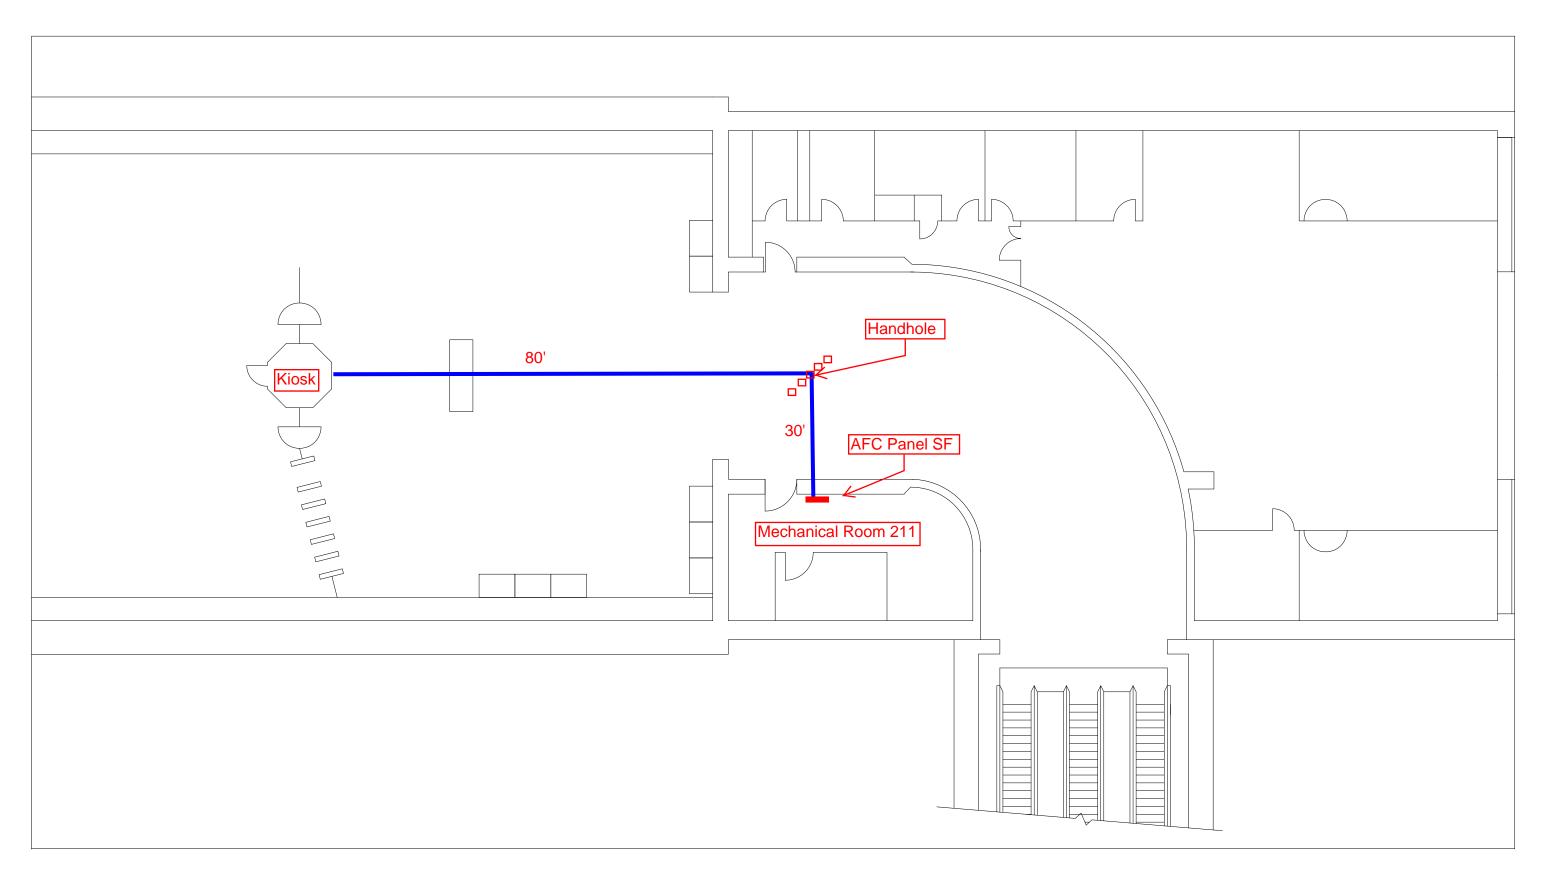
Handholes located on Mezzanine Level outside Mechanical Room Room 211
